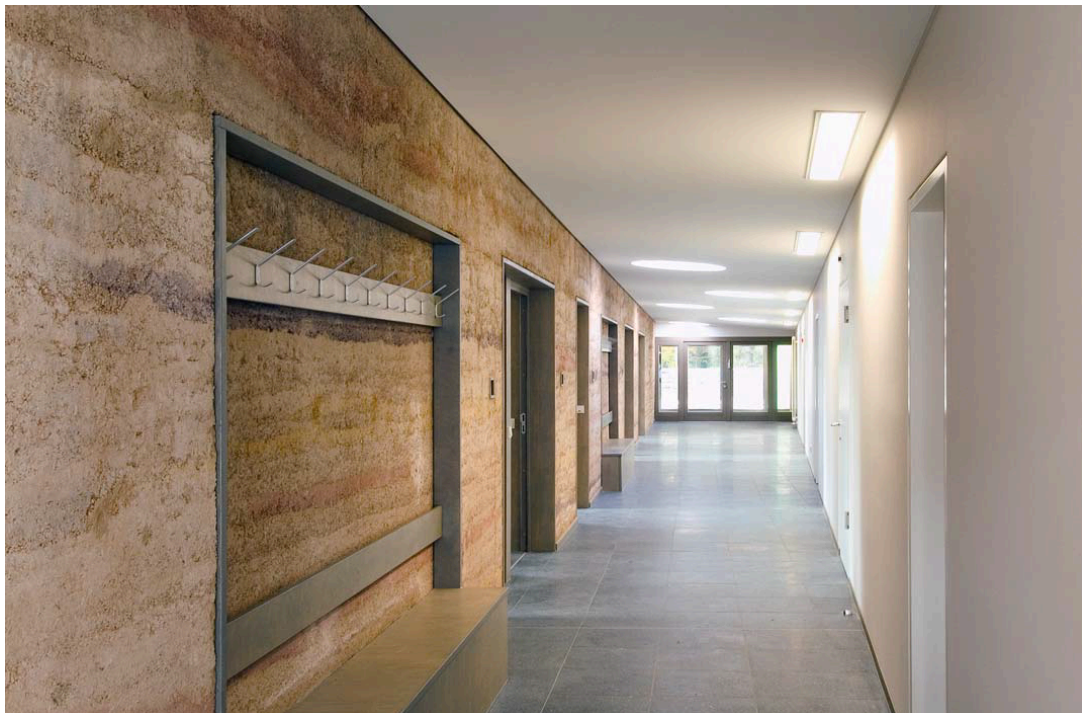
Thick RE wall dividing the Youth Center [11]
